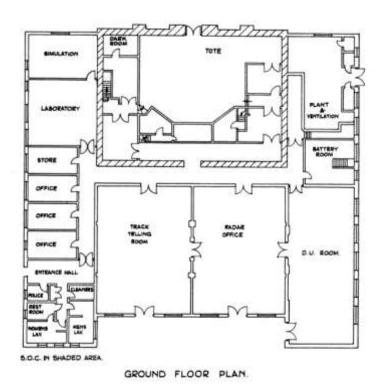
Ground floor plan of H Building 1954 (Image reproduced with permission of MRATHS)
